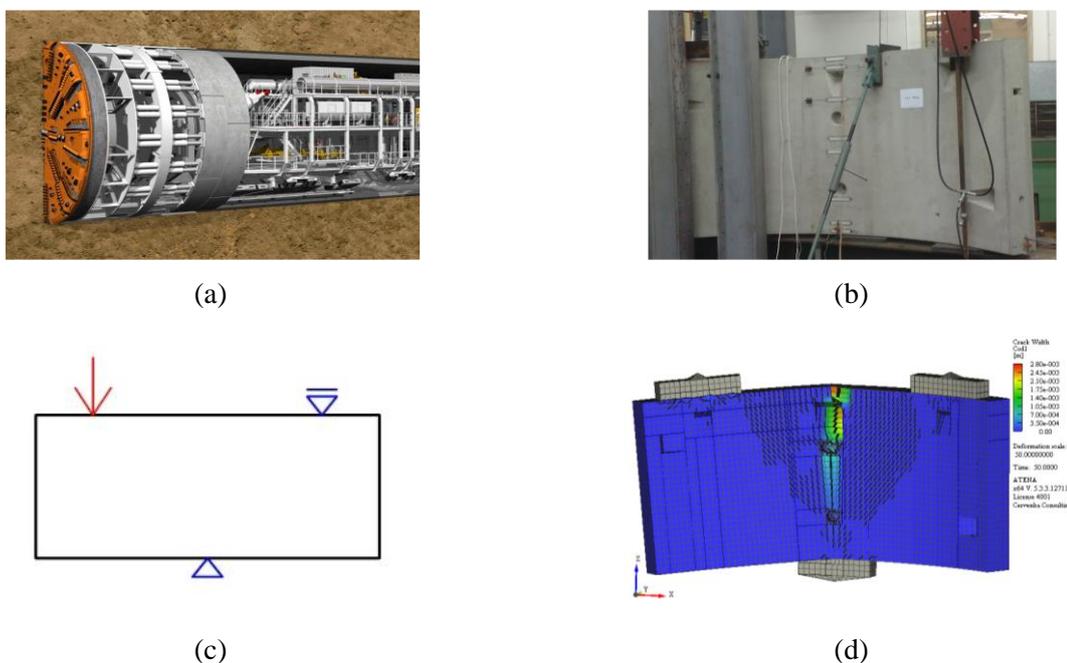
Case study example of a tunnel tubbing made of fibre reinforced concrete
